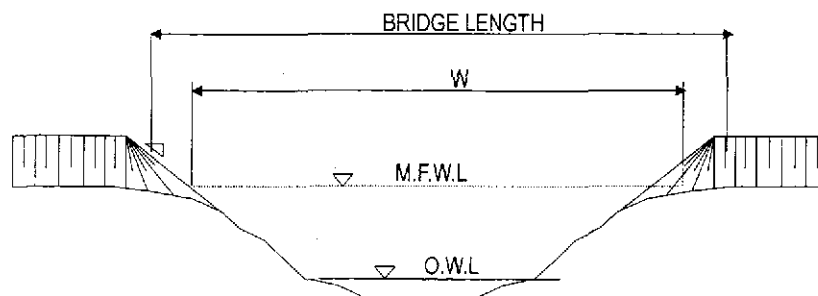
CROSS-SECTION OF BRIDGE SITE
